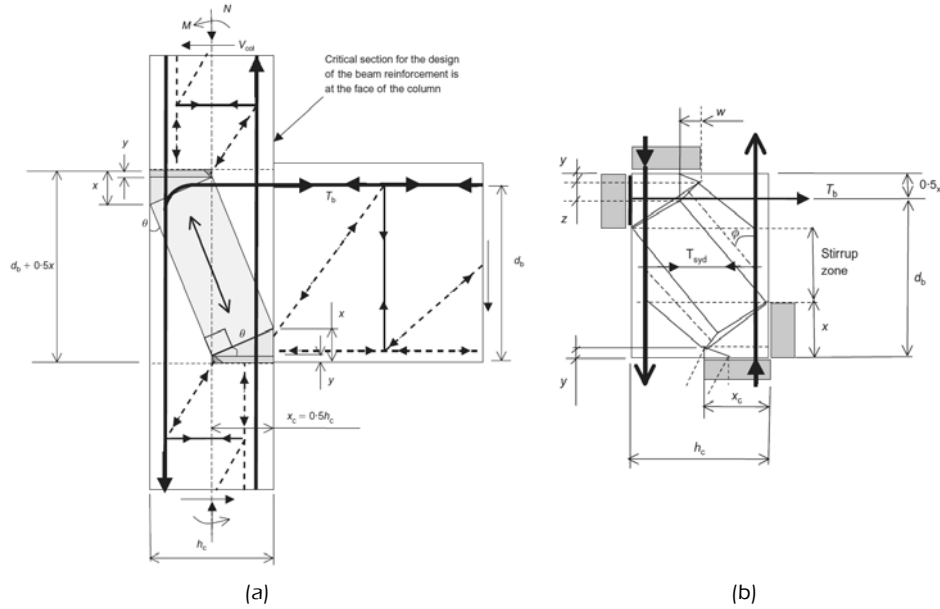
Strut and tie model for external beam-to-column joint without stirrups (a) and with stirrups (b) (Vollum & Parker, 2008).
